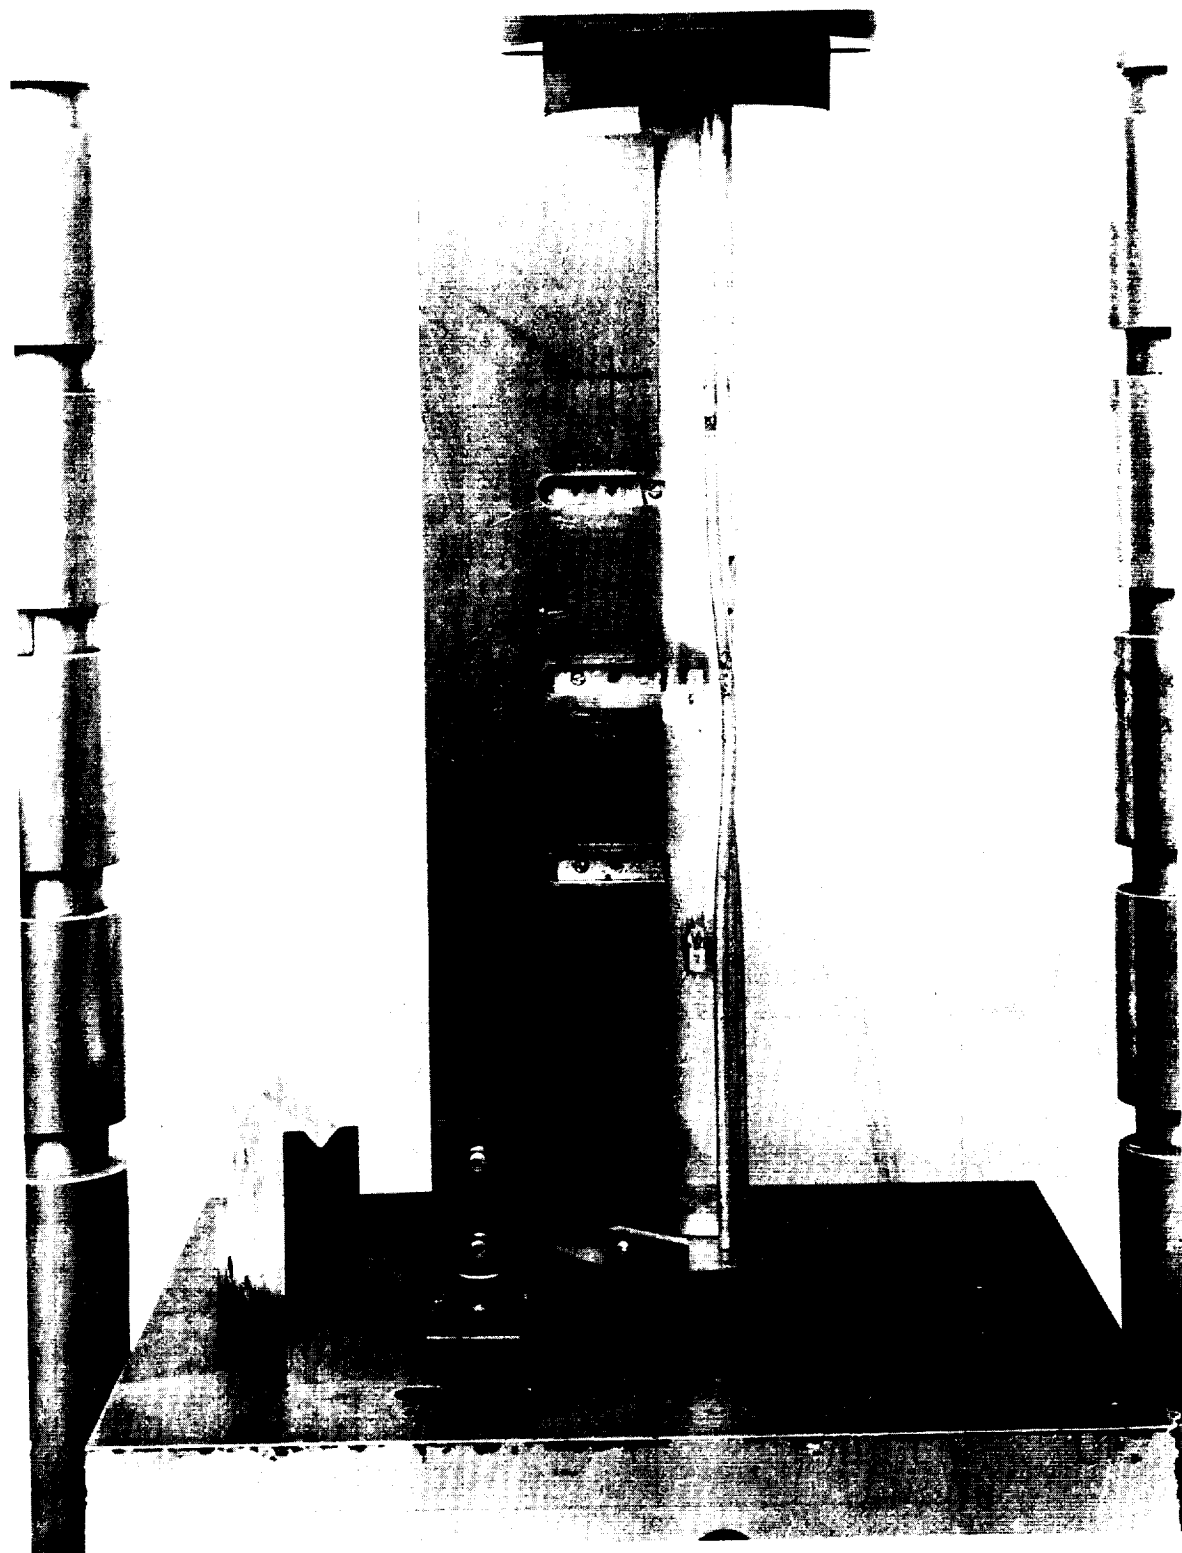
TYPICAL ELEMENT COMPRESSION TEST SETUP
